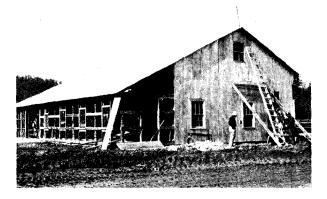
The rigging loft, of frame construction with corrugated sides and roofing, provided facilities for splicing cable, making slings, and other rigging devices.
